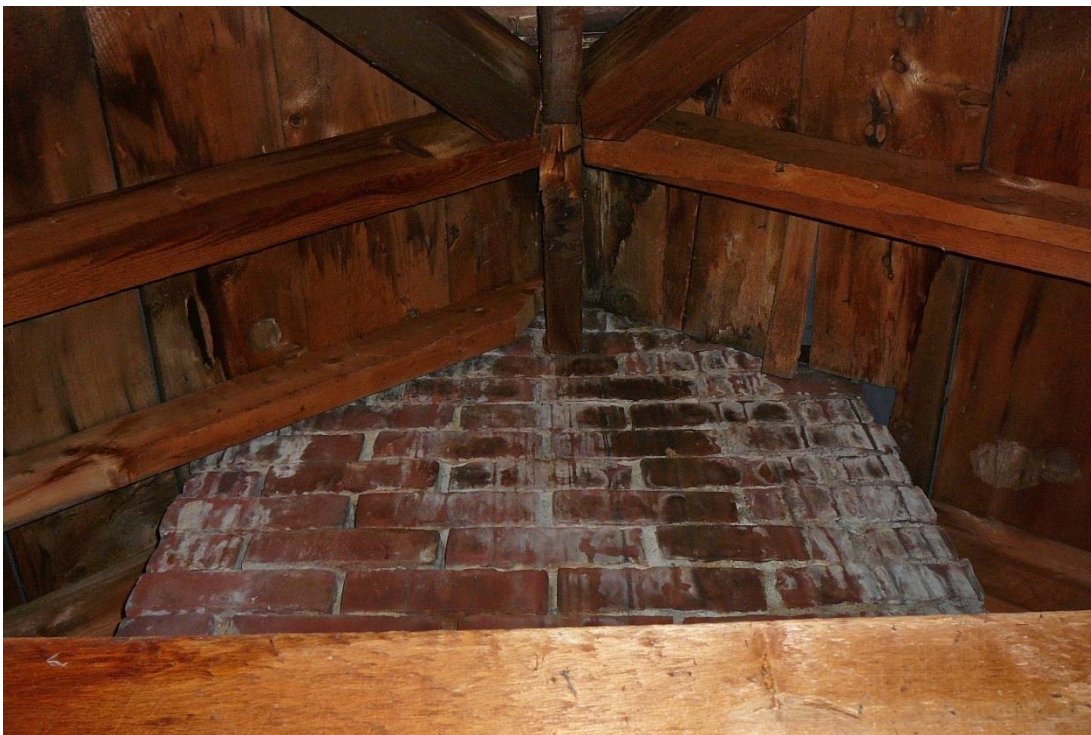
Attic floor roof structure, view up to chimney from south room (A4) (Quinn 2017).
